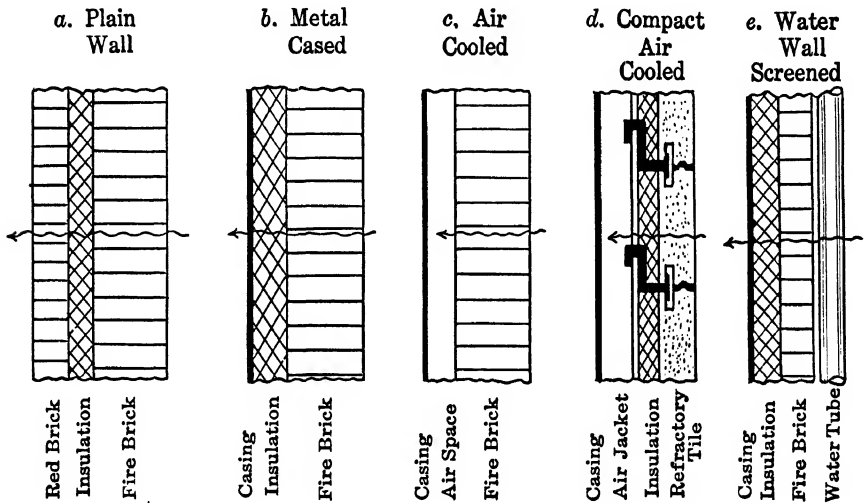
Furnace wall sections. (Arrows give direction of heat flow.)
